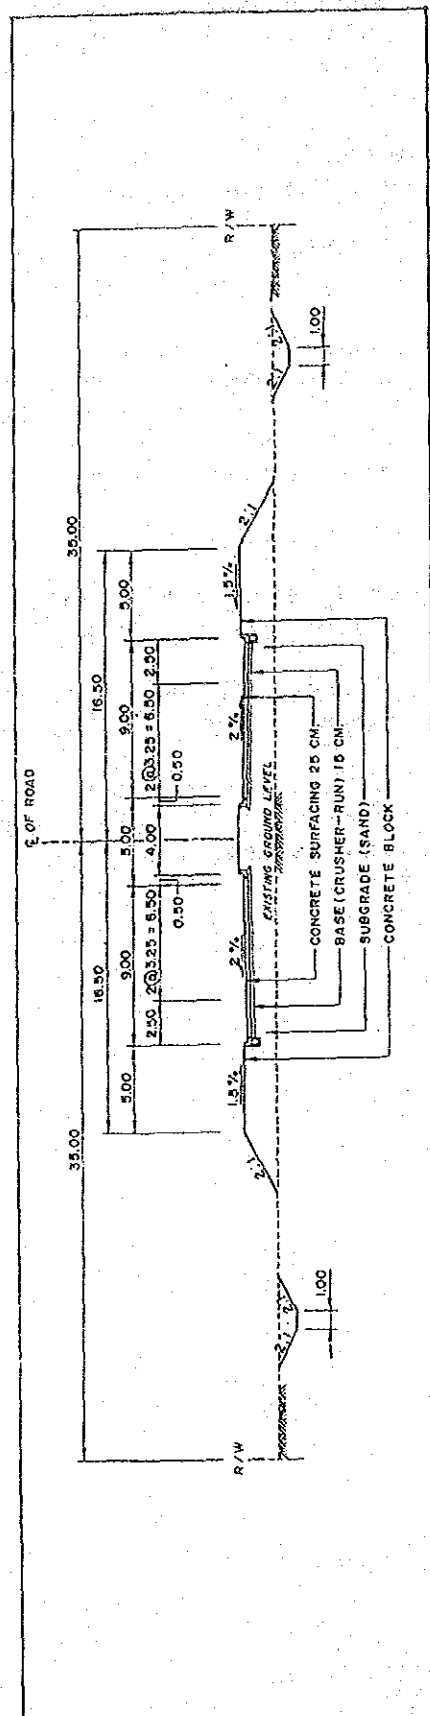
Typical Cross-Section (STA.20 - 84)
